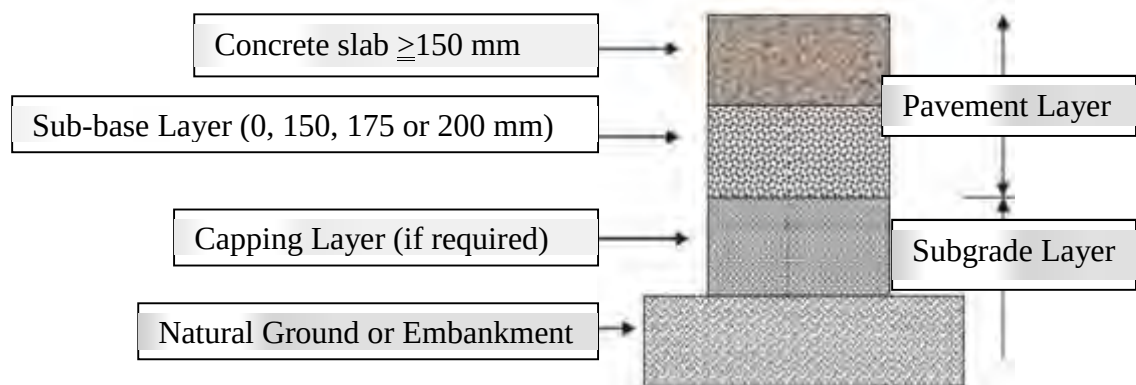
Pavement Layers of Rigid Pavements [10].
